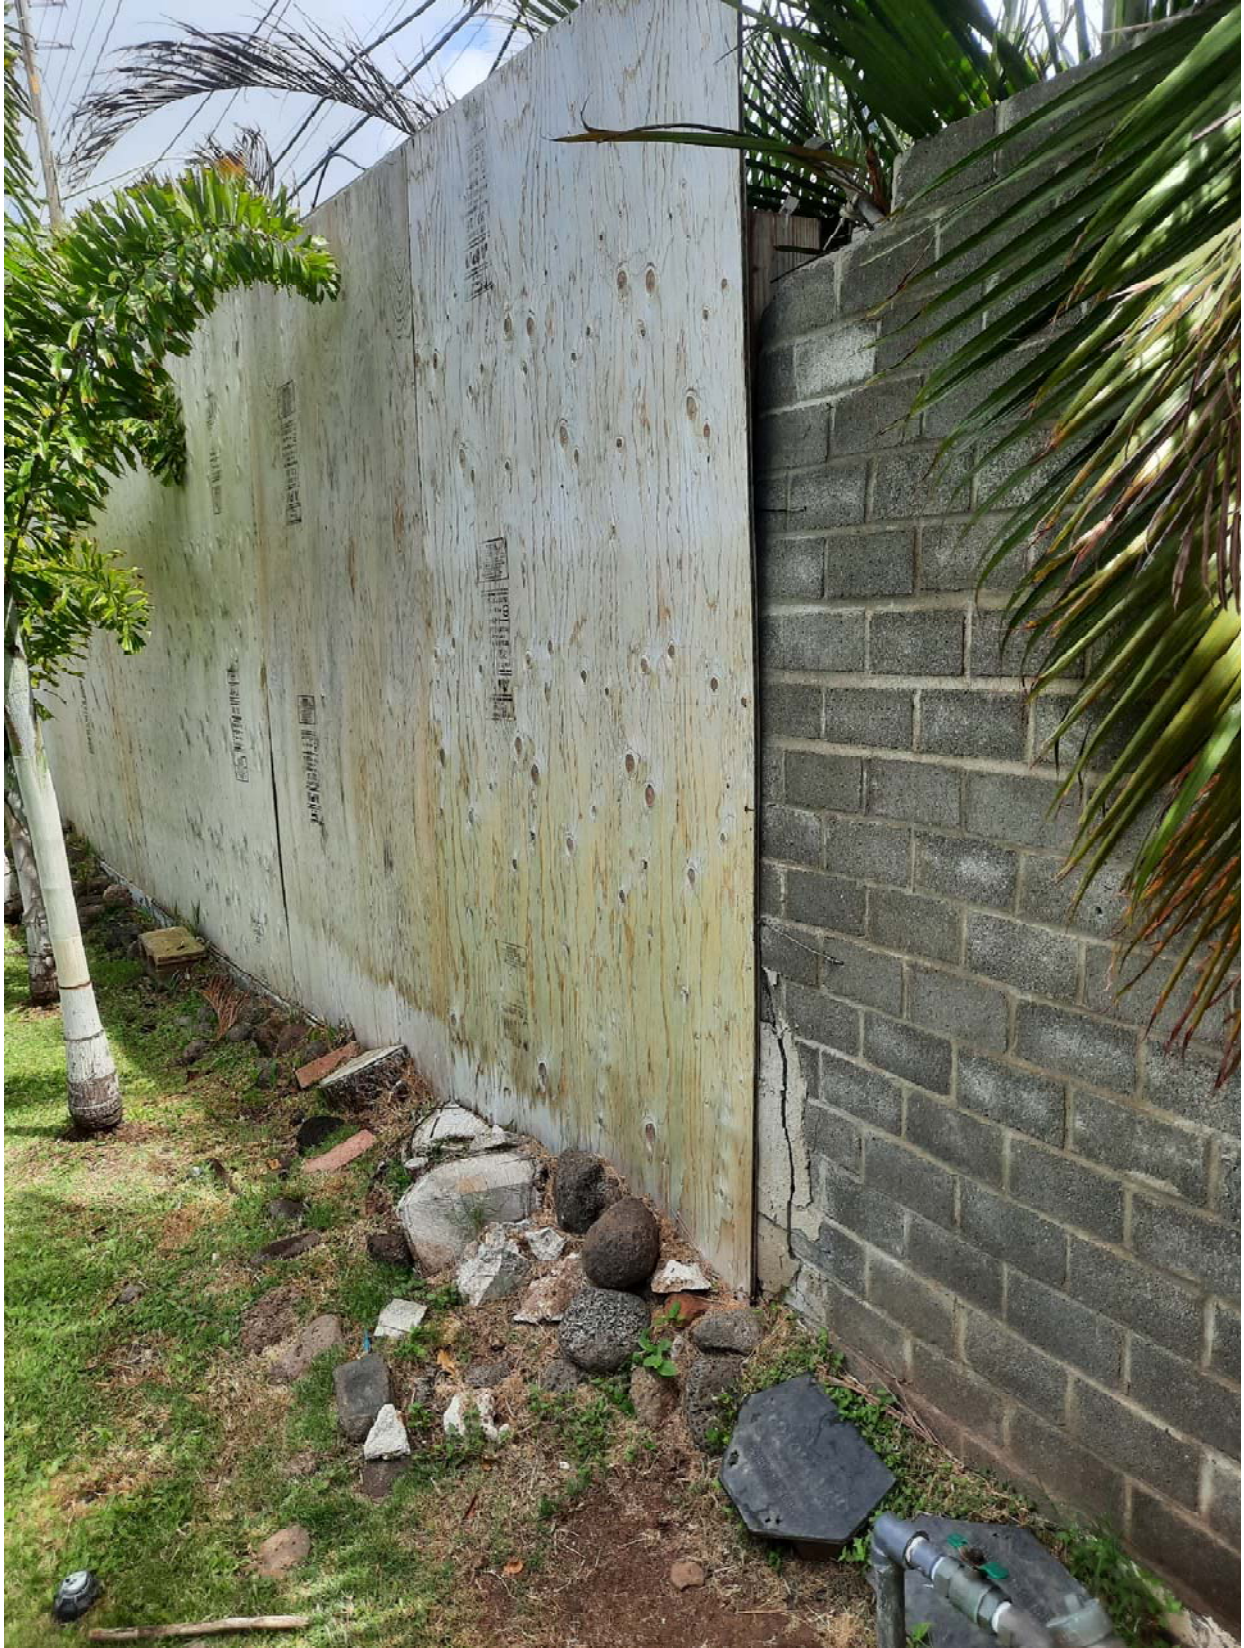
Mauka* side wall constructed of cinder blocks and plywood boards, with small, rounded basalt cobbles piled at base (view to northeast)
